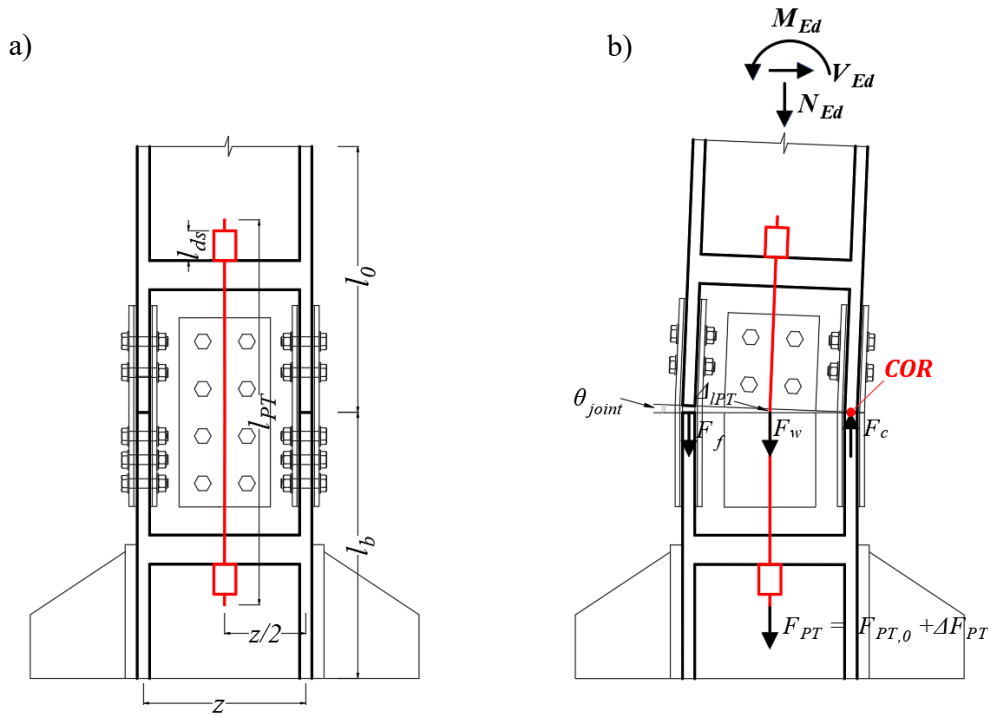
SC-CB (a) Geometrical dimensions; (b) Schematic representation during the gap-opening.
